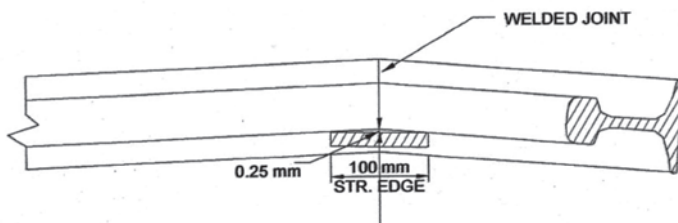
(c) Tolerance for Finishing on Sides of Head of Welded Joint with New Rails
